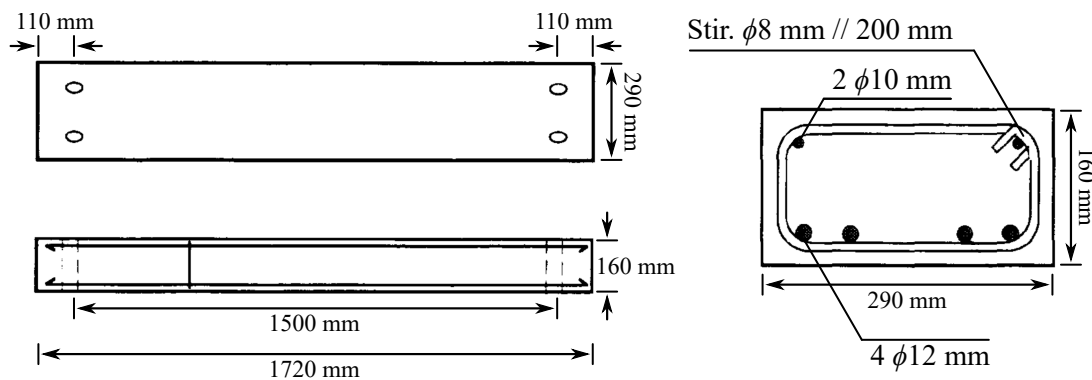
Geometry and reinforcement details for one-way RC beams (Adapted from [91])
